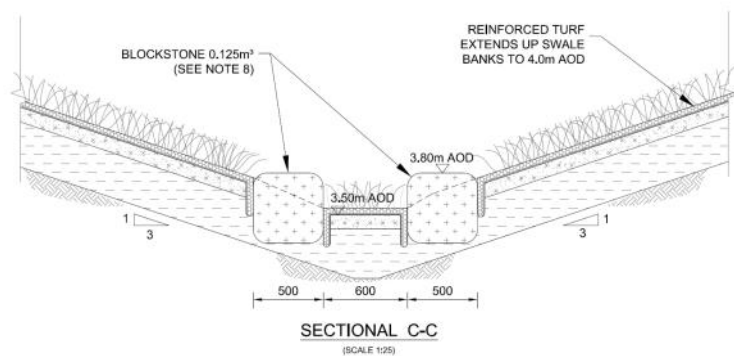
Cross Section through swale & check dam (Barry Plowright)
